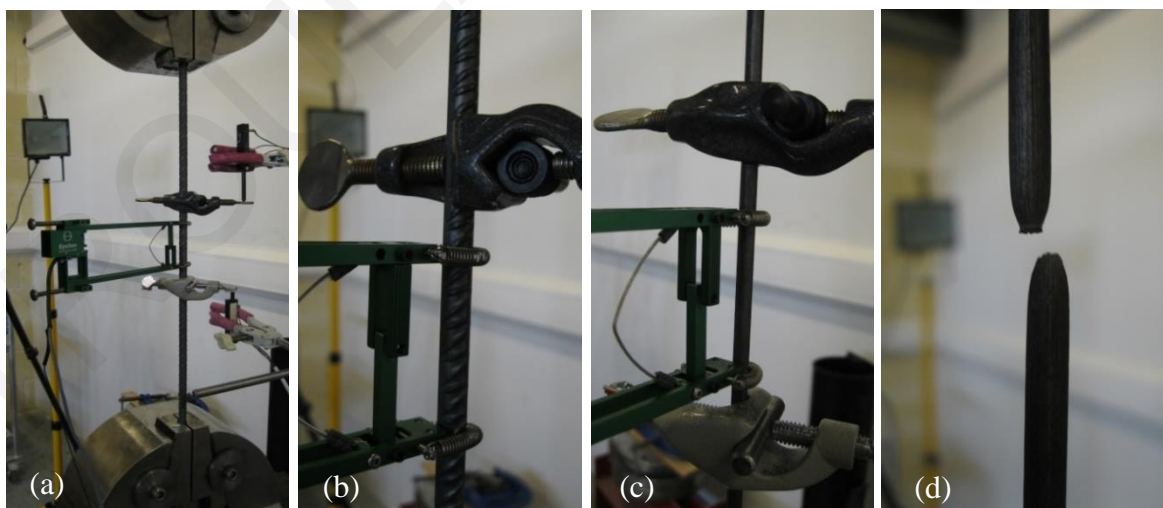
Steel bars tested under uniaxial tension (a) setup, (b) extensometer and LVDT, (c) bar of 6mm without ribs, (d) failure of bar
